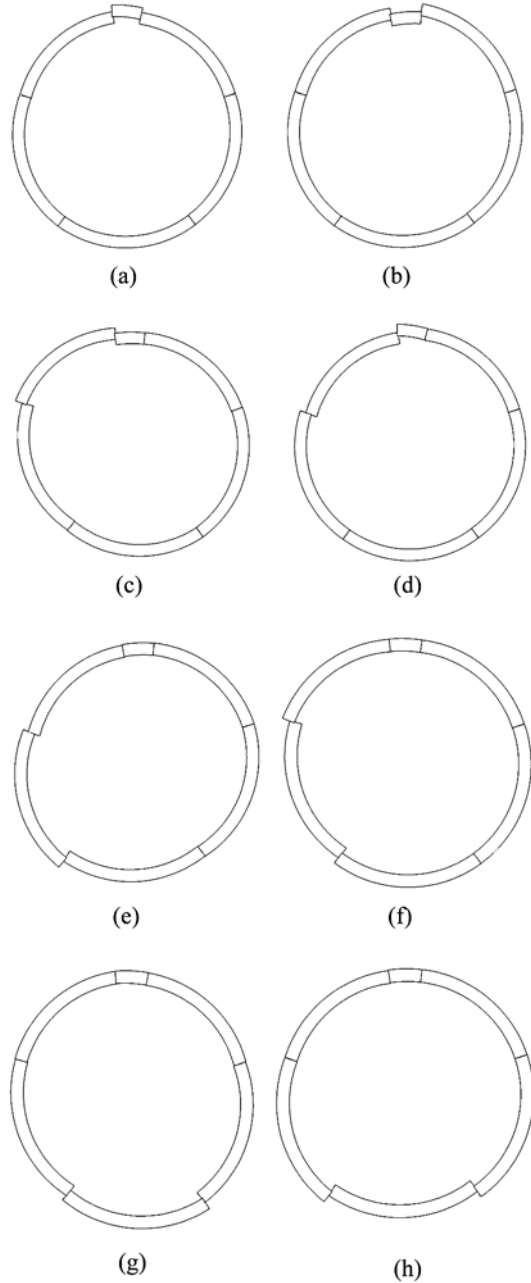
Displacement of rings without wedge-shaped segment (enlarged 20 times). (a) Tolerance 1; (b) Tolerance 3; (c) Tolerance 5; (d) Tolerance 7; (e) Tolerance 9; (f) Tolerance 11; (g) Tolerance 13; (h) Tolerance 15
